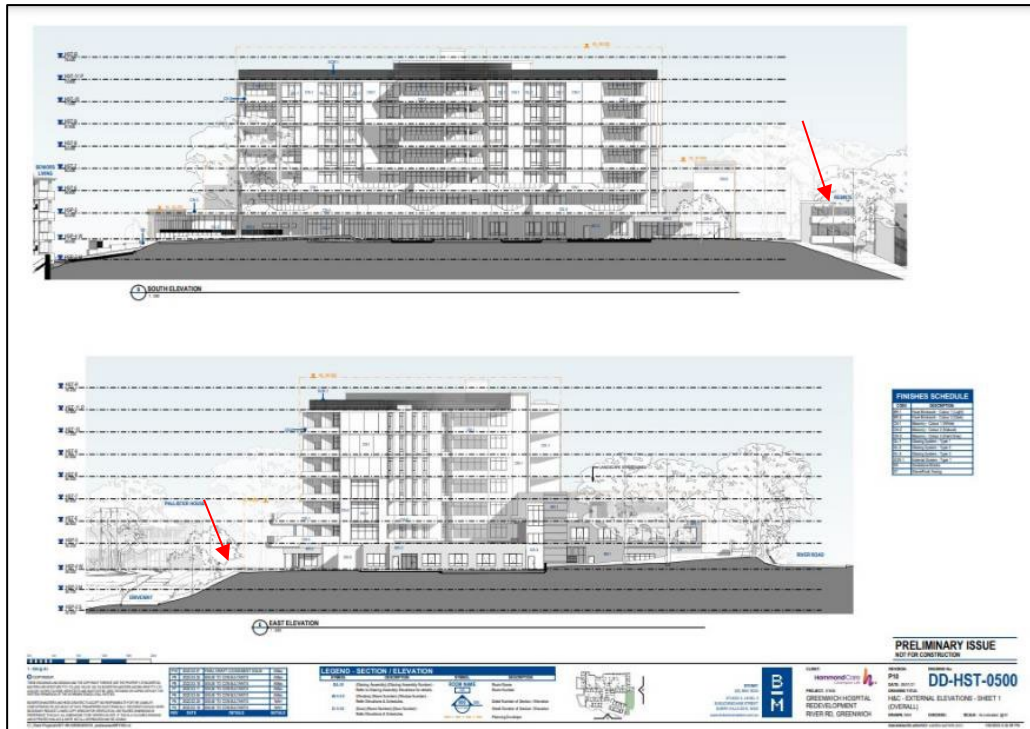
East and South elevation Red arrow on East elevation showing podium level and red arrow on South elevation showing Respite
